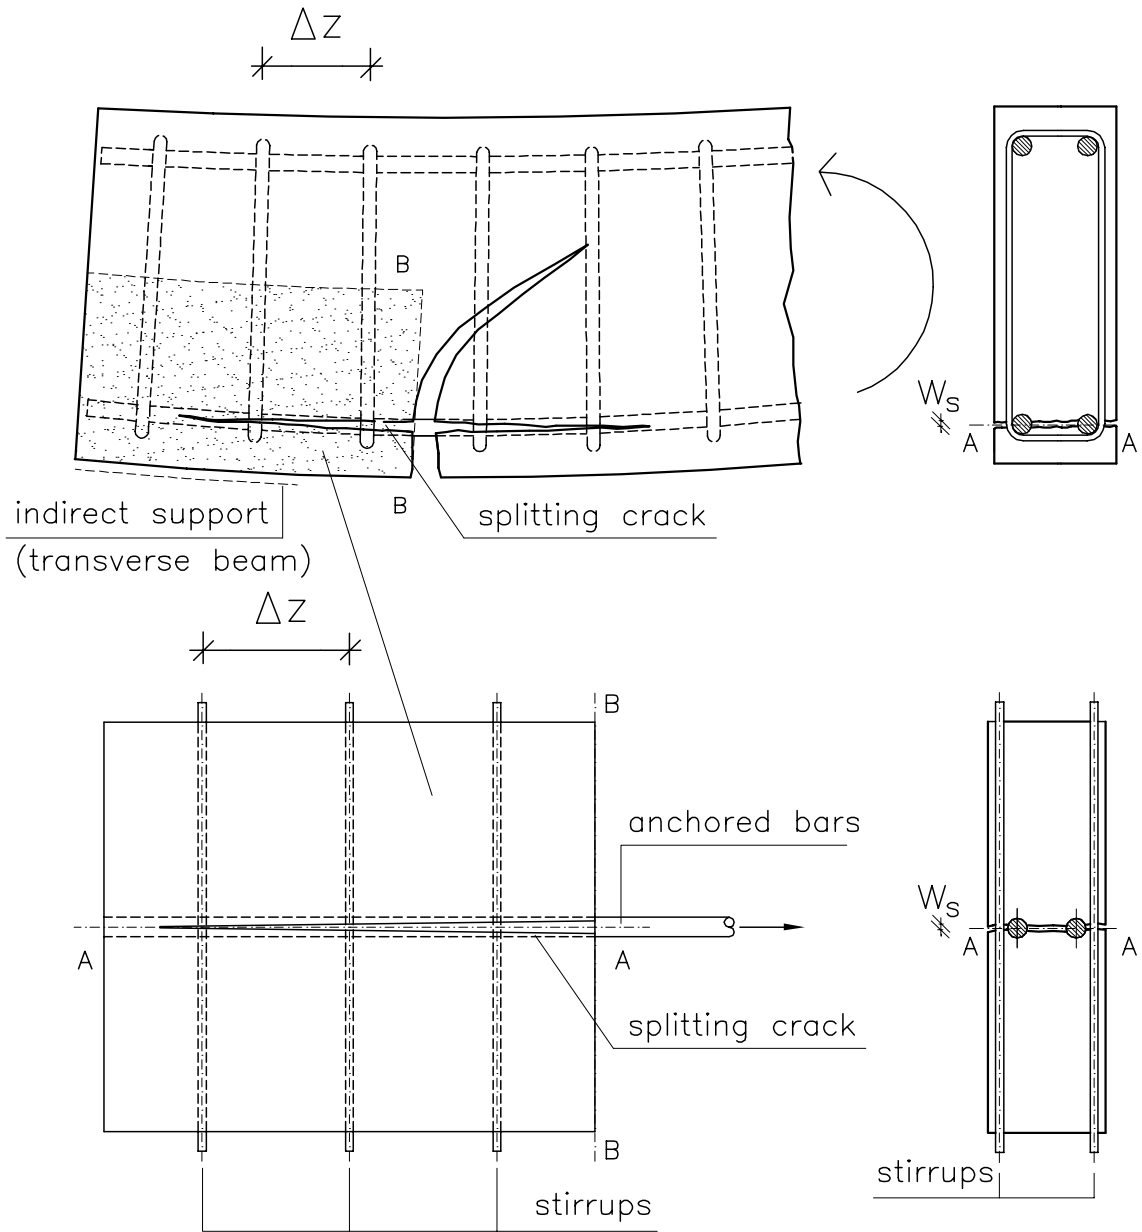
Splitting-crack propagation in anchorages and scheme of the specimen tested.
